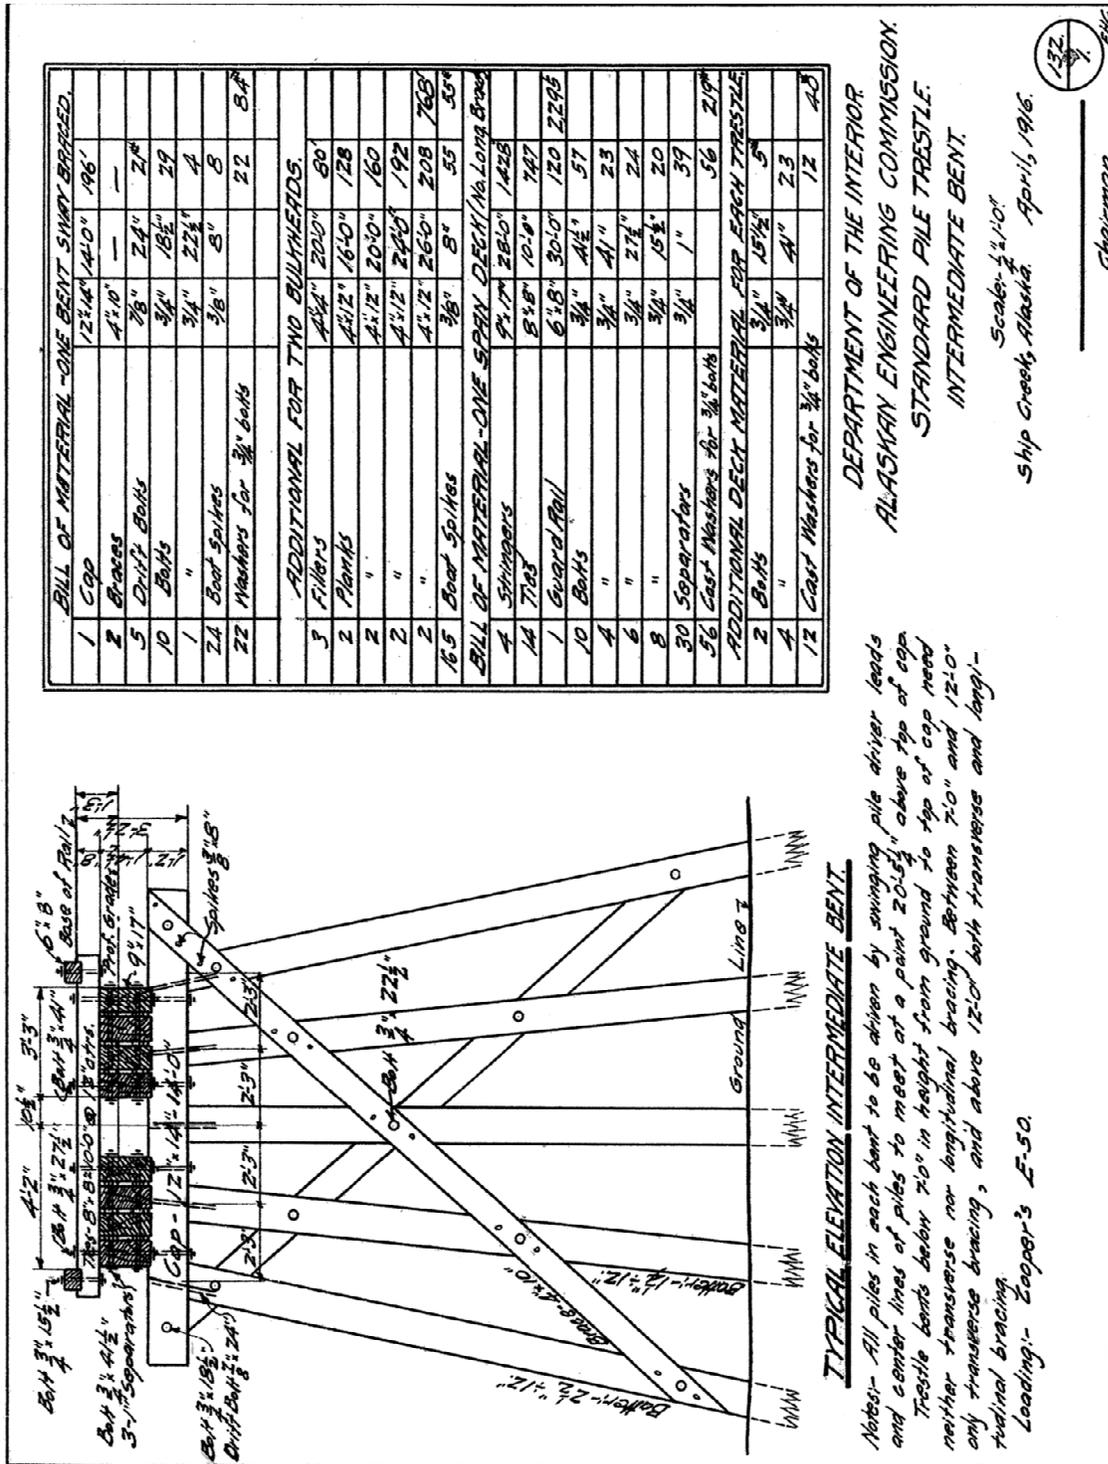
Standard Pile Trestle, Intermediate Bent, April 1916, Sheet 132.1.
